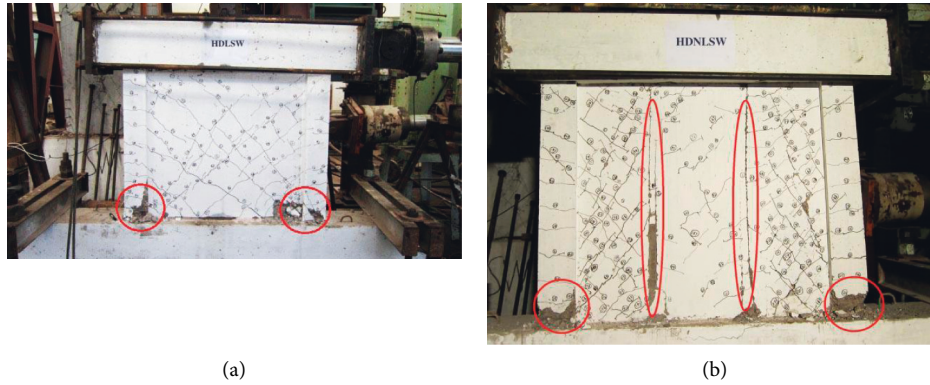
Crack development of the two specimens: (a) specimen HDLSW; (b) specimen HDNLSW.
